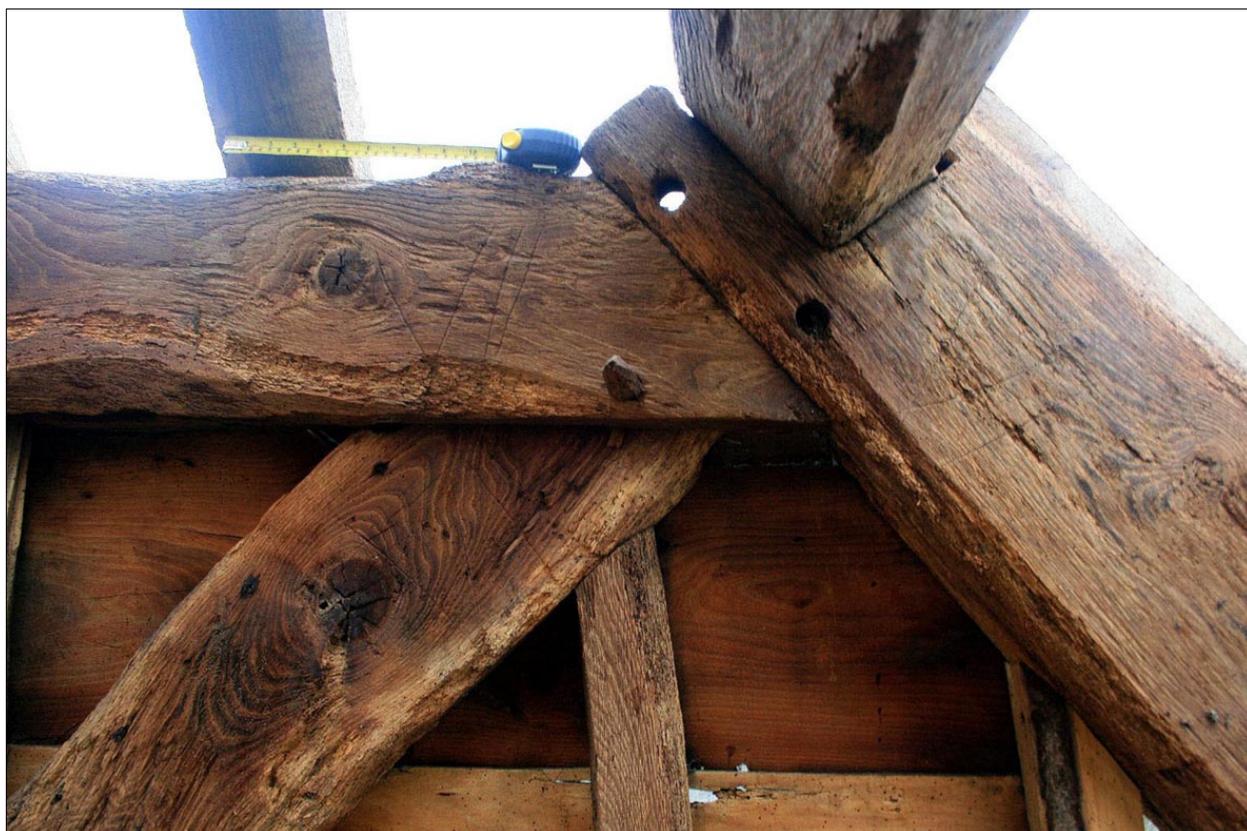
Bay 6, truss 6. Principal rafter-collar beam joint, with medieval carpenter's numerals. Facing east.
